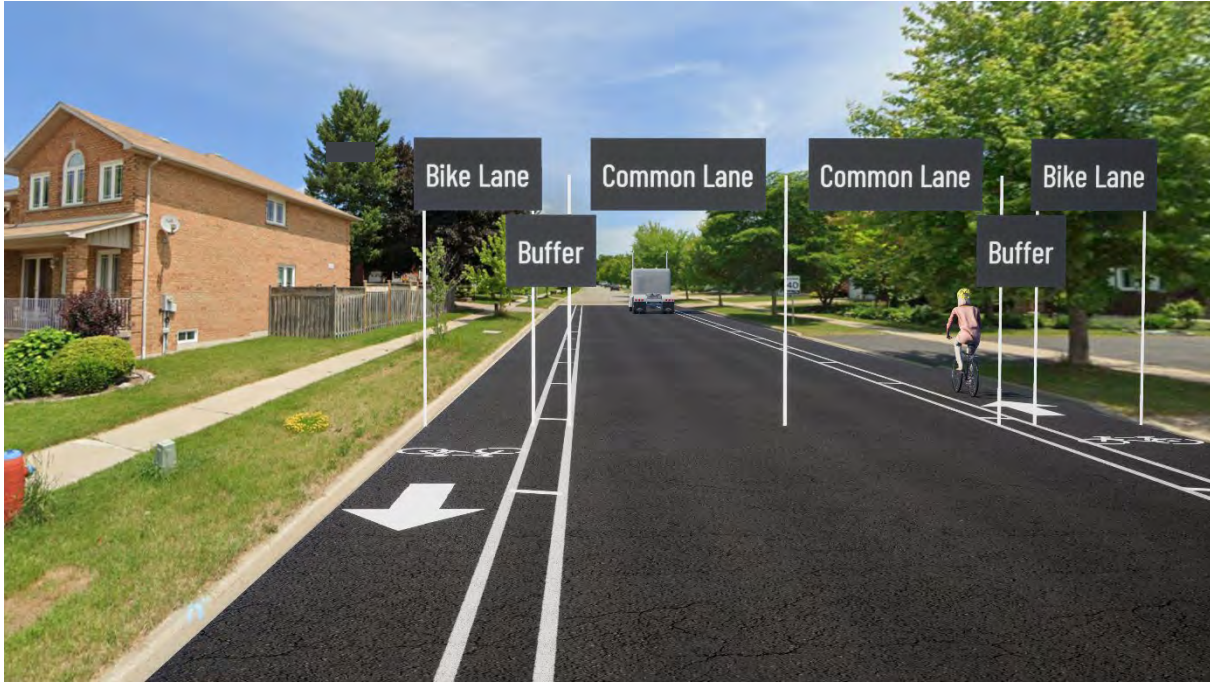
Corridor Option A1 – Buffered Bike Lanes on Briggs Avenue between Bayview Avenue and Edinburgh Drive – (Looking east)
